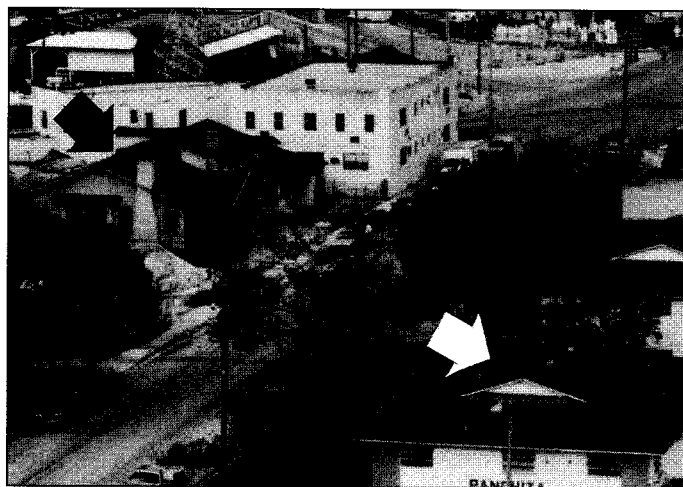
These two damaged asphalt shingle roofs (see arrows) are located near downtown Miami. The estimated peak gust wind speed was 125 mph (56 m/s).
